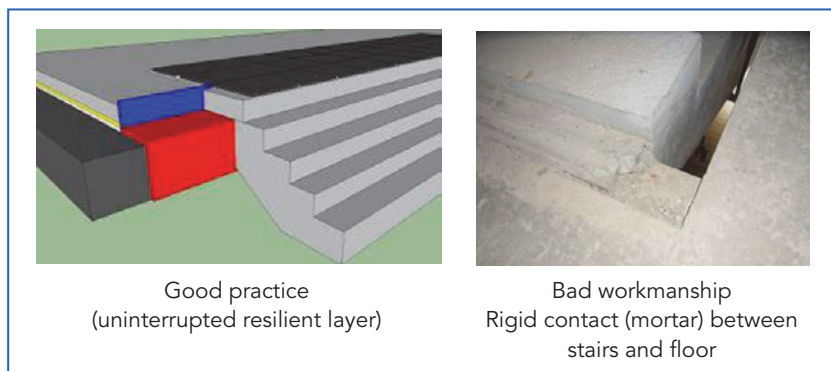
Good practice and bad workmanship for stairs/floor junction.
